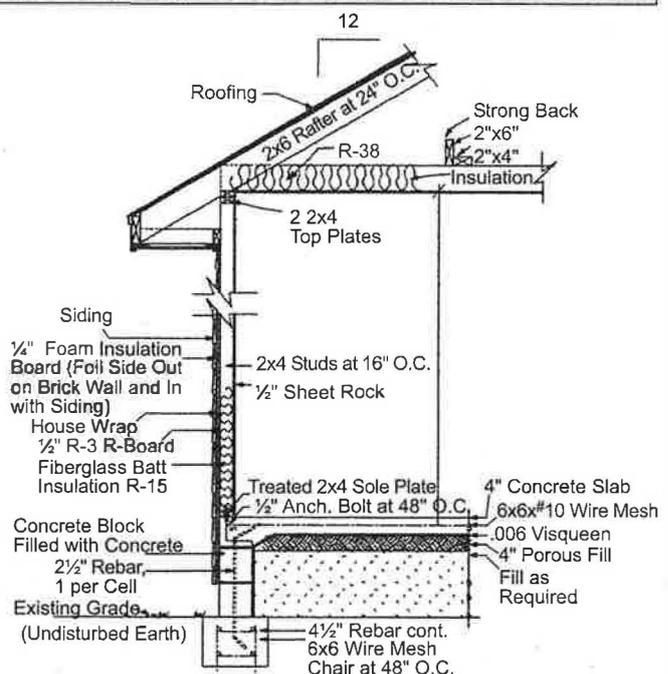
Smith adds an extra layer of insulating sheathing to the exterior walls to create R-21, which is uncommonly high for homes along the Gulf Coast. Note the details on the raised-chainwall slab.
